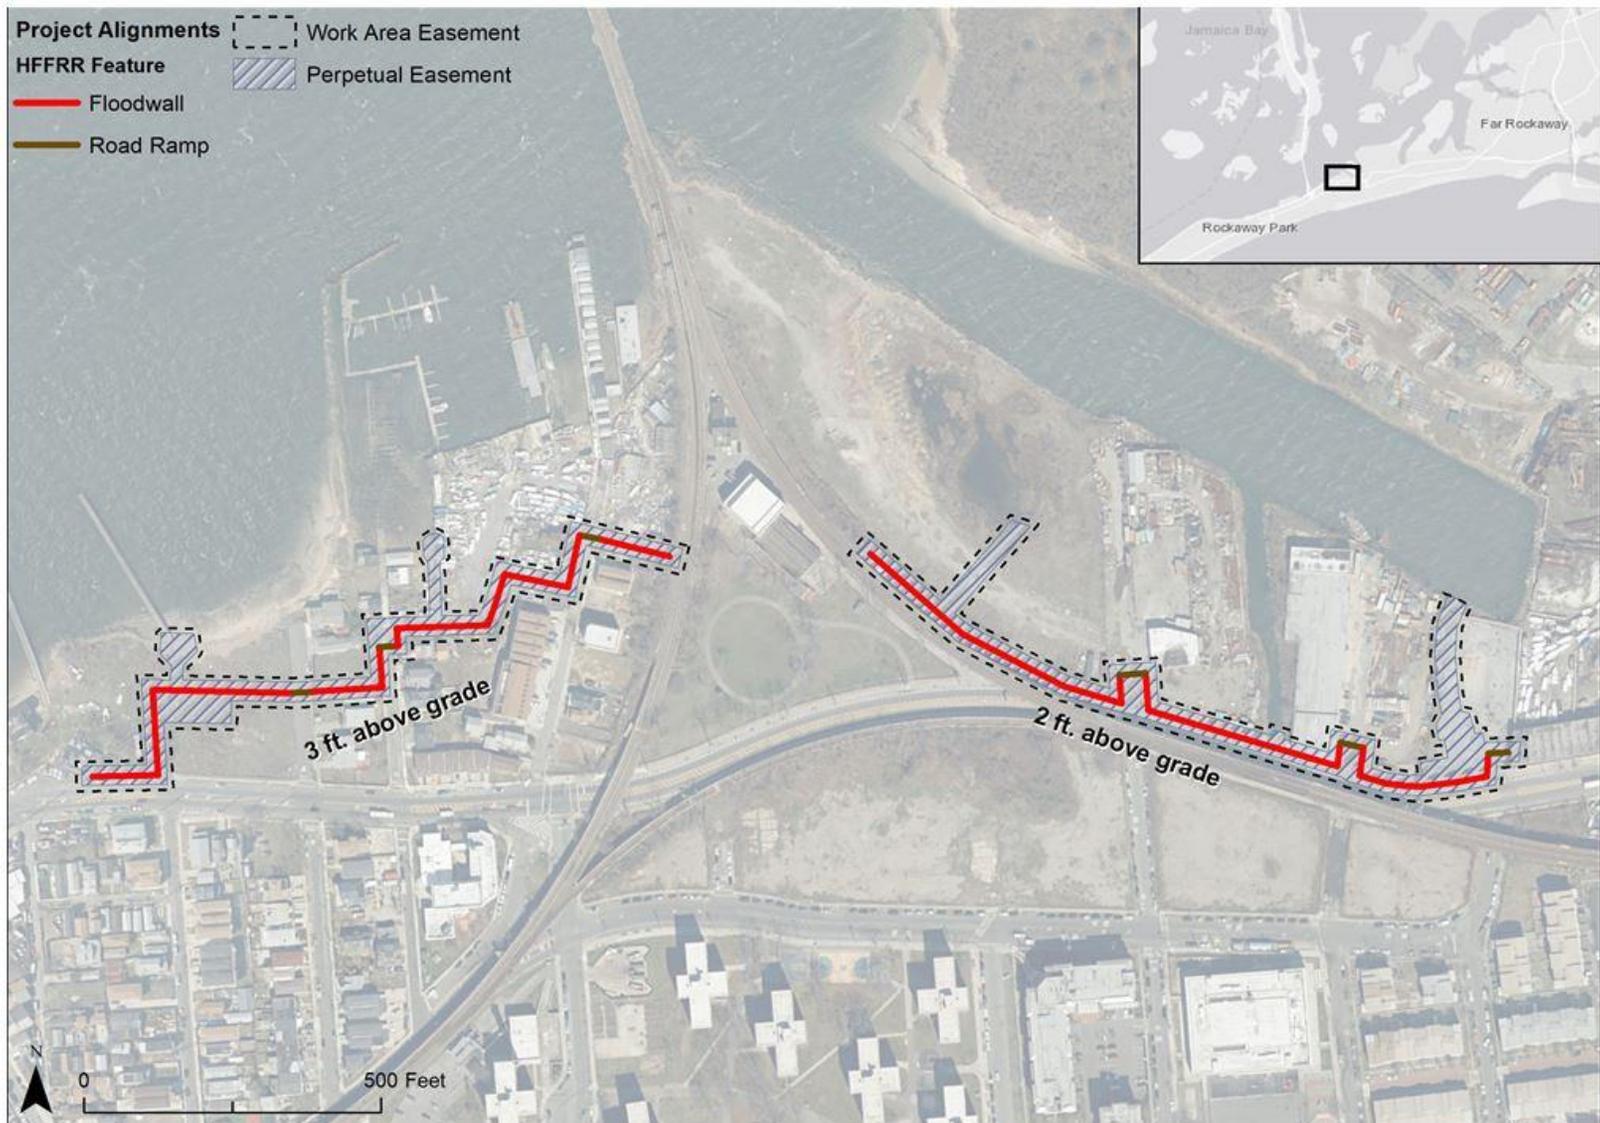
Mid Rockaway – Hammels Area HFFRRF Project Plan
